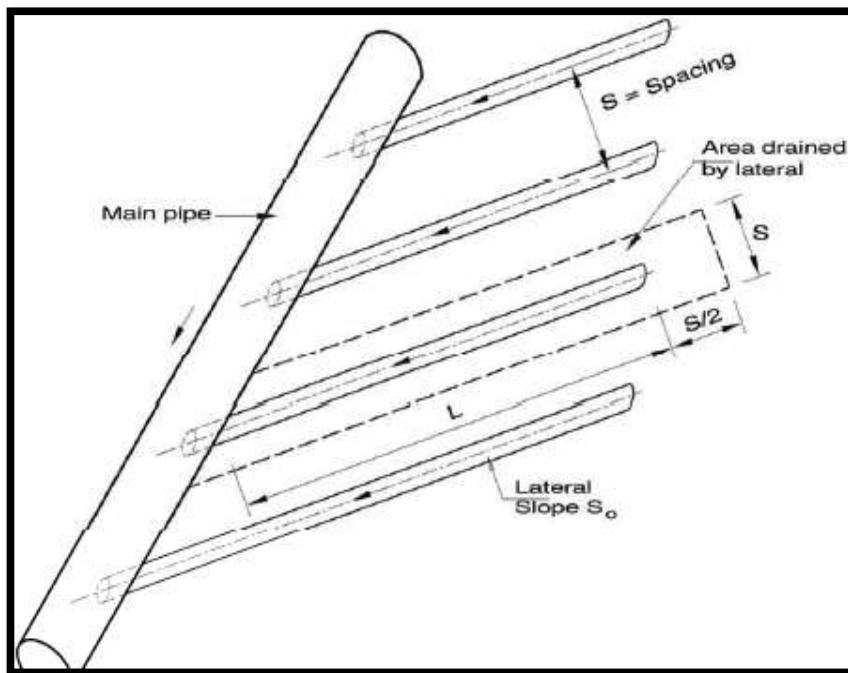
Typical Herringbone Sub-Surface Drainage System (SANRAL, 2007:9-18)
